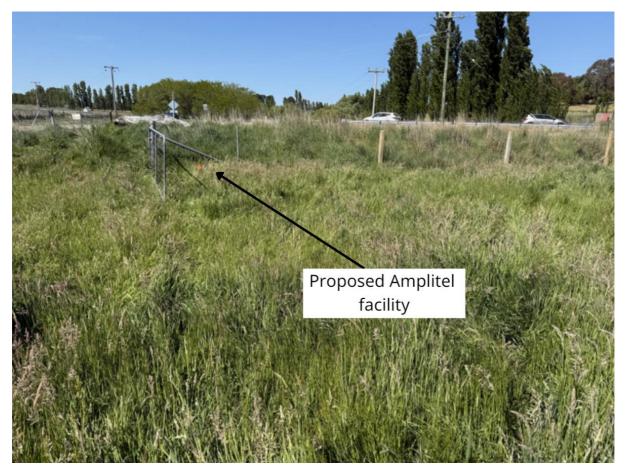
looking south to the proposed facility standing on lot A on Plan 948768 (source: BMM)
